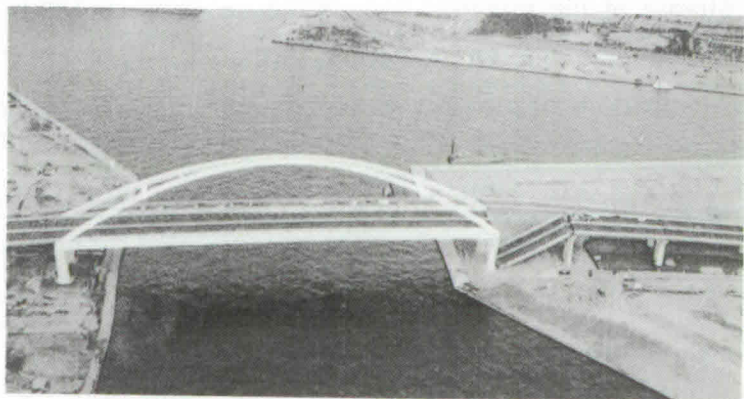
Collapse of girder of Nishinomiya-ko Bridge at the Koshien-hama
